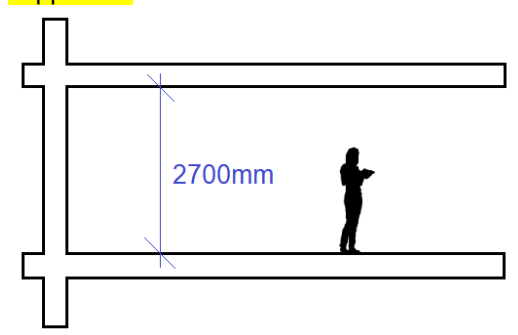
Minimum floor to ceiling heights for boarding houses and co-living housing
